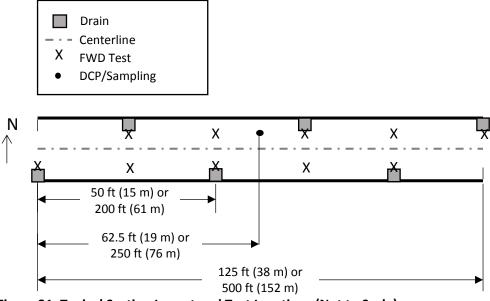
Typical Section Layout and Test Locations (Not to Scale).
